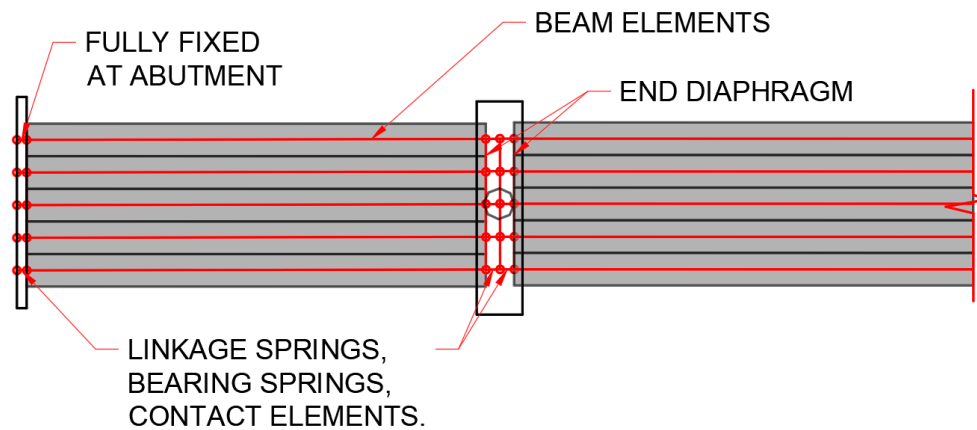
Generalised MDOF model layout for Abutment A and Pier B.
